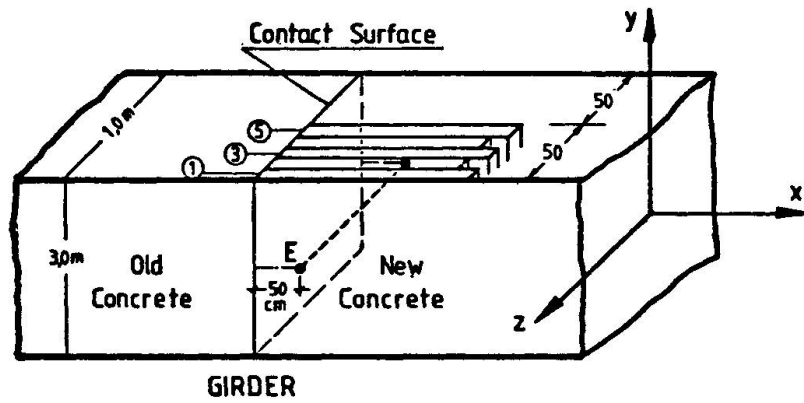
Stresses in The Web of a Bridge- Girder Due to Hydration of Concrete [33]
